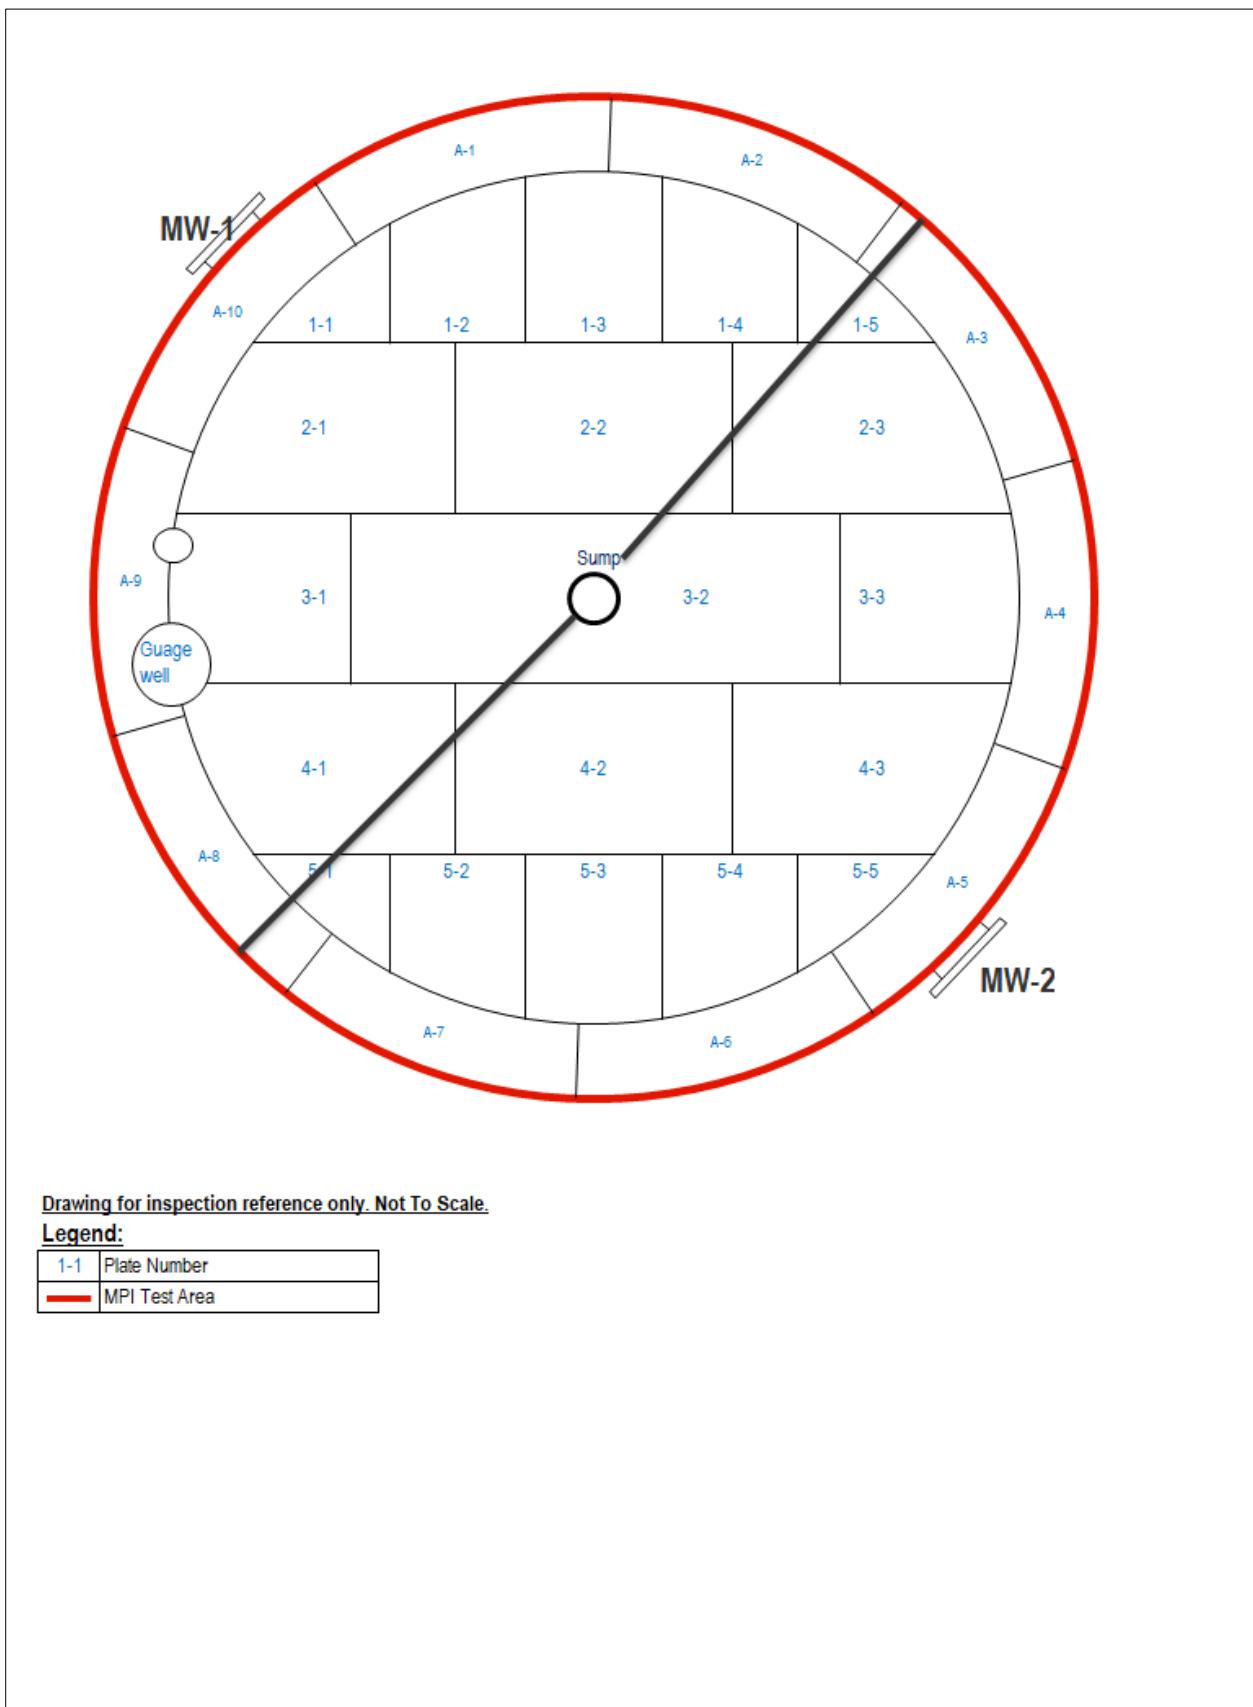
Magnetic Particle Inspection Area Layout
